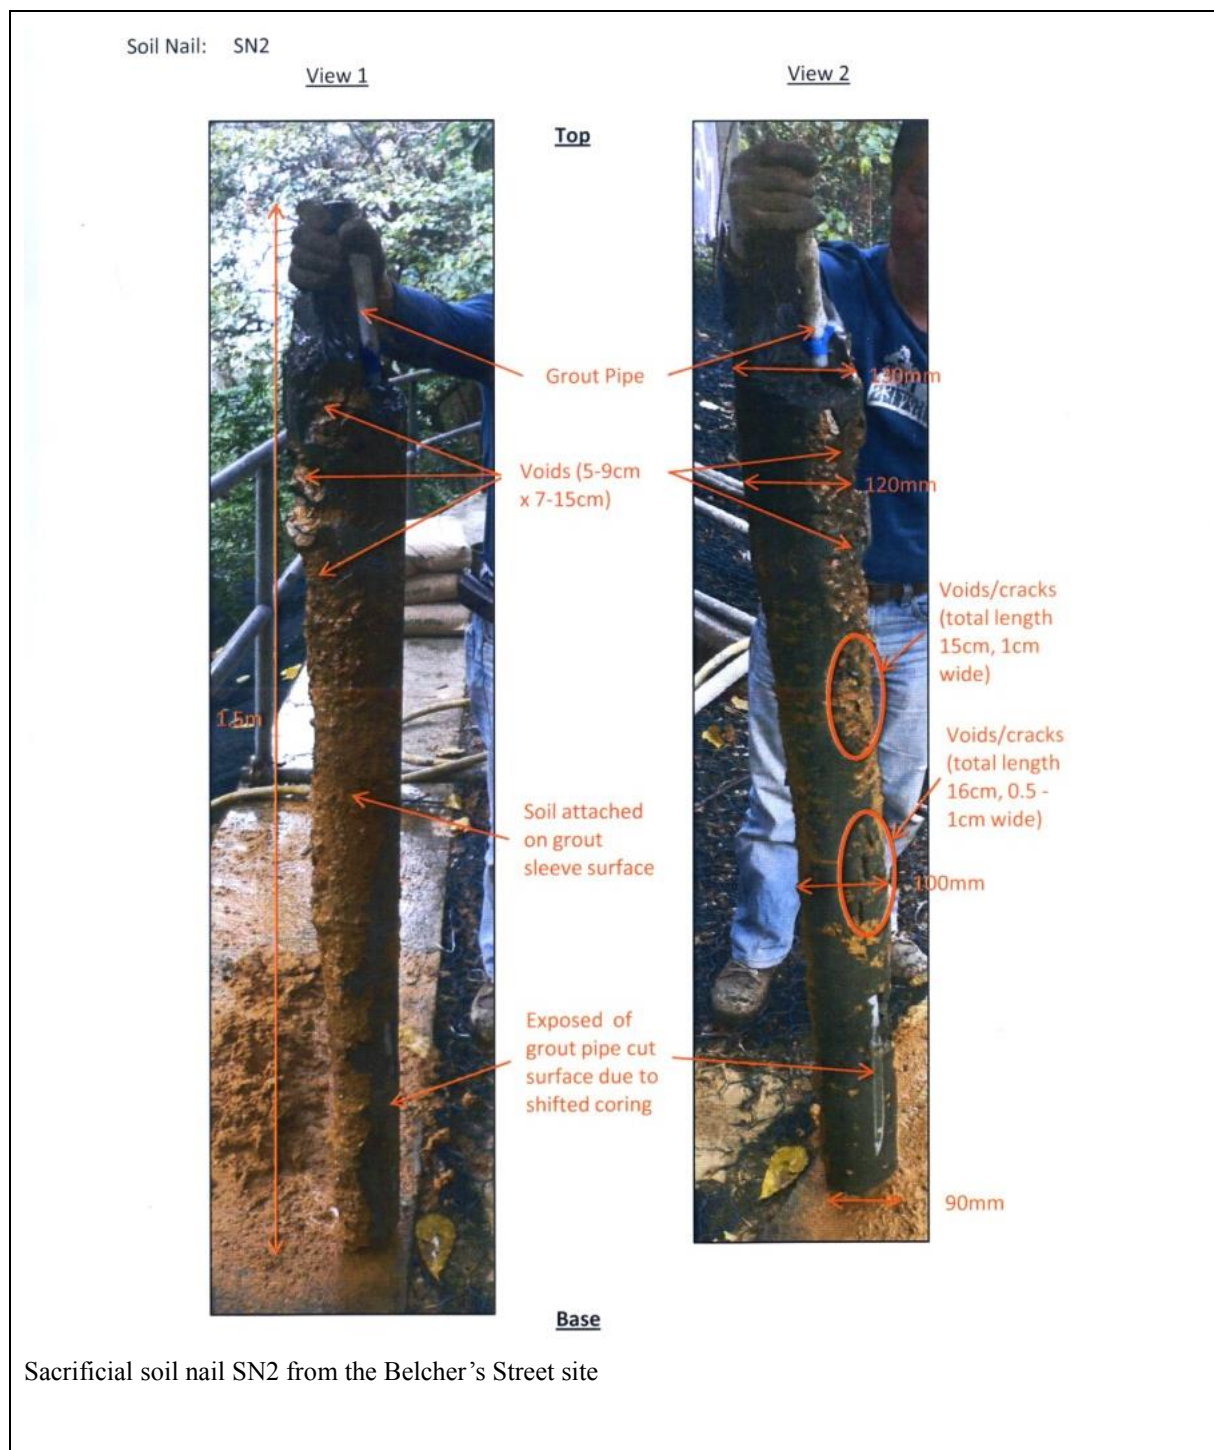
Example of Voids and Cracks on Grout Sleeves in Exhumation Exercise in 2011
